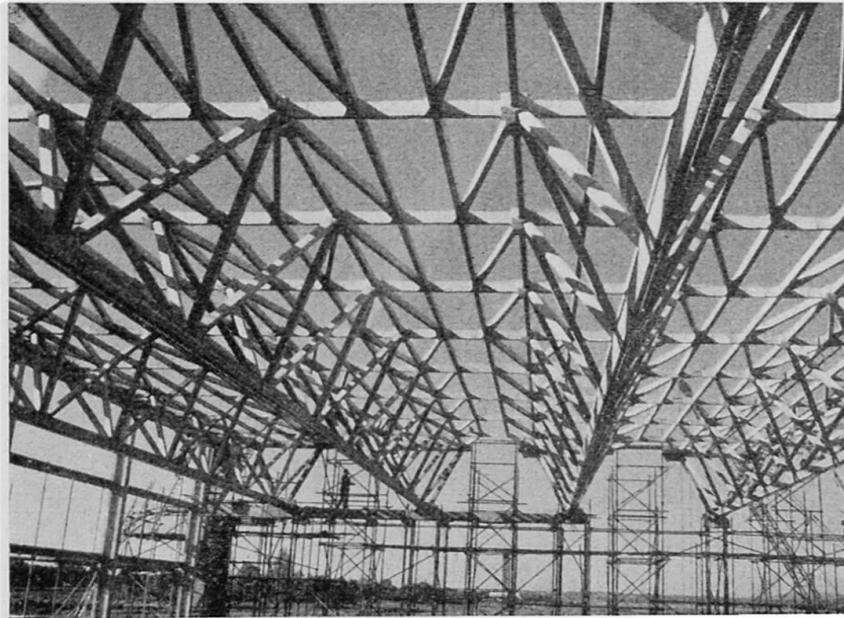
Transair Hangar at Gatwick Airport of prestressed precast concrete.
